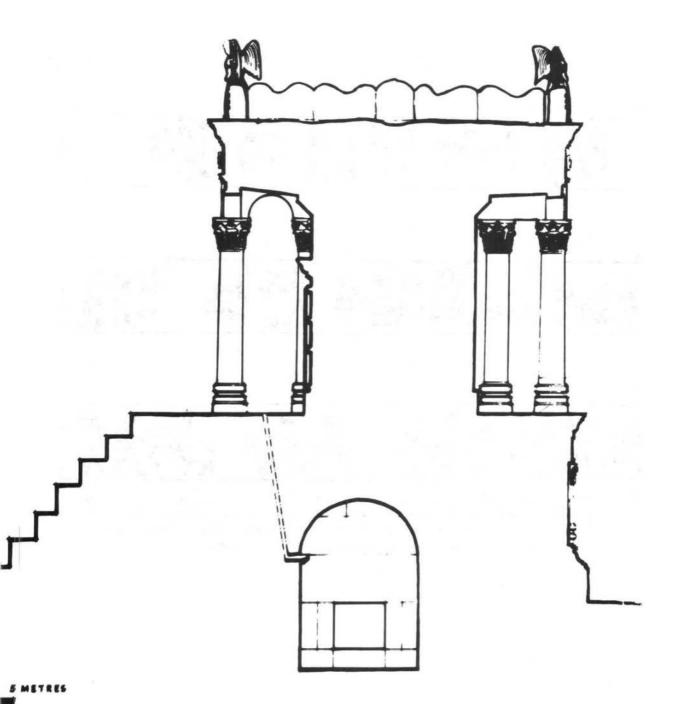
Tomb North B: east elevation and section reconstructed. Drawn by J. Keelan.
